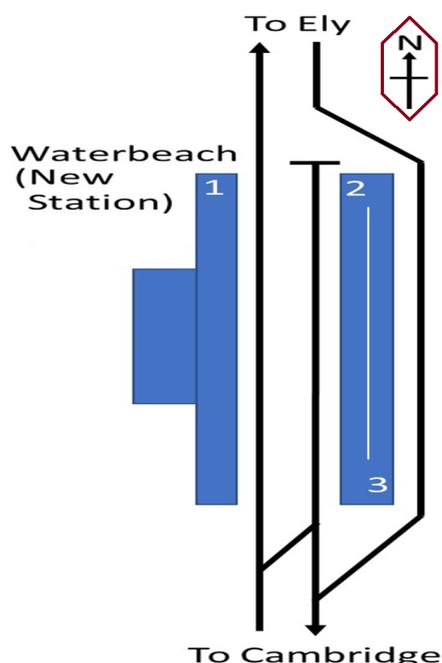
(right): Plan showing our proposals for a turn back platform at Waterbeach New Station. In providing an extra platform that enables a Cambridge cross-city service to operate, it would also provide relief at Cambridge Central station as it would be unnecessary to build new platforms for EWR there.
